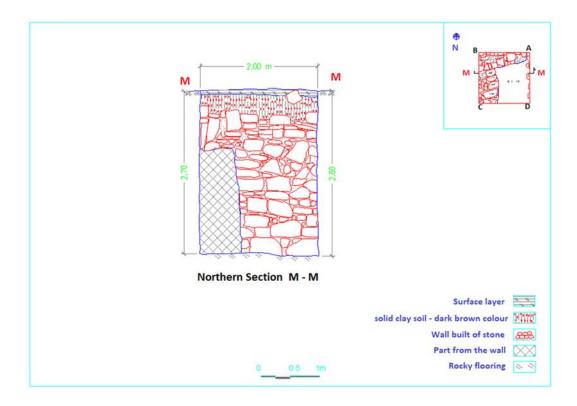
Northern section shows the building wall without mortar (clay or plaster)
